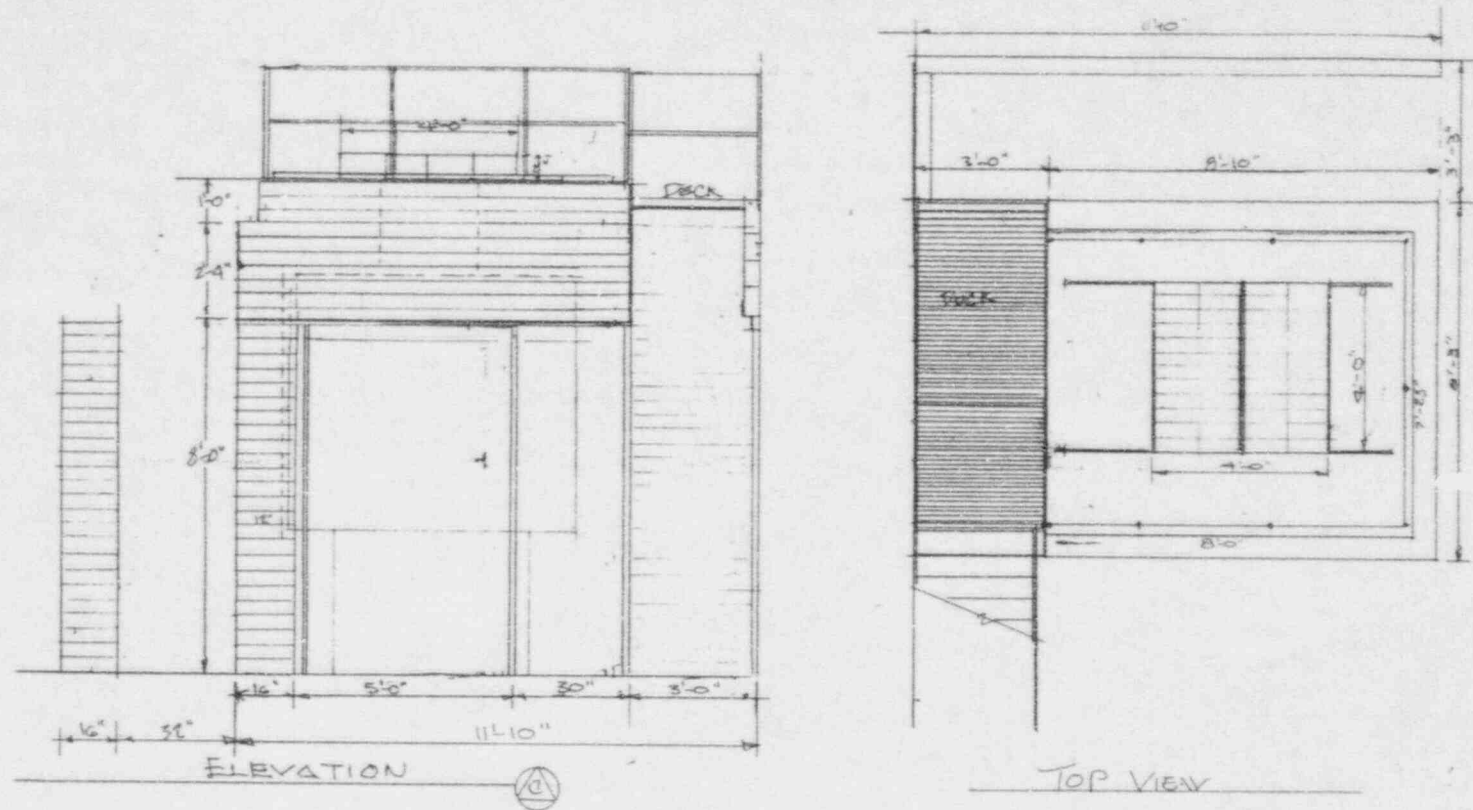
External concrete block shielding for AGN-201 reactor. Elevation C is facing south. Top view of shielding.
